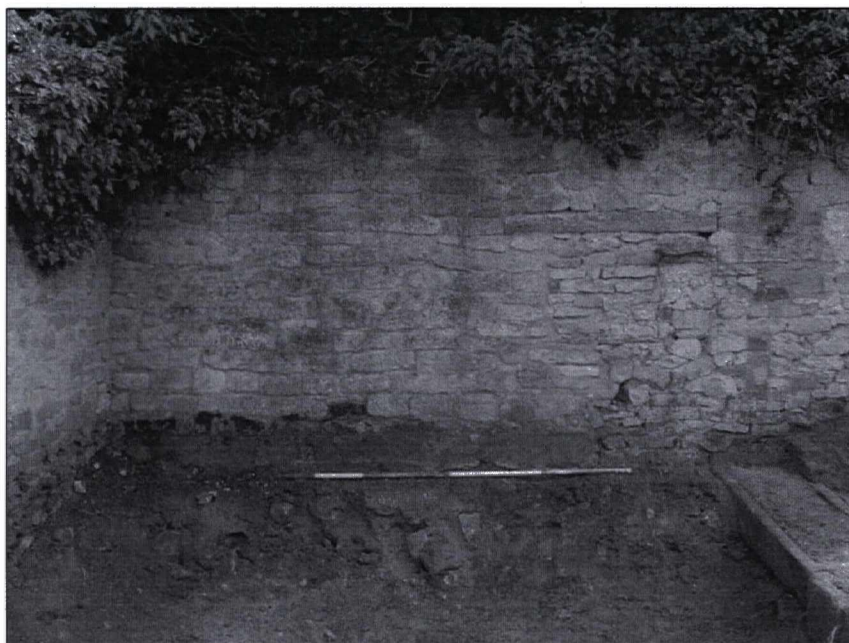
view of the northern end of the east wall of the former stables/cowhouse with an in situ lintel above a blocked window, looking east
